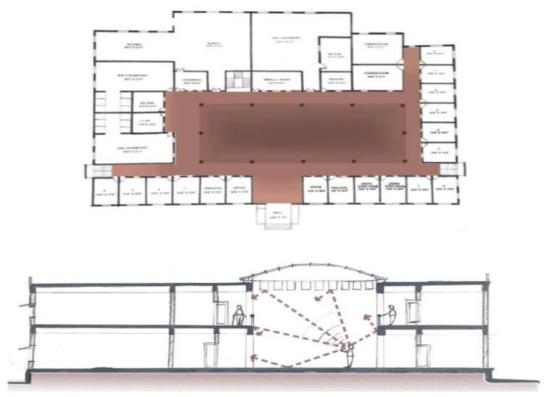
Plan and Section Highlighting the Placement and Adverse Effect of Atrium Space on the Spatial Arrangement
